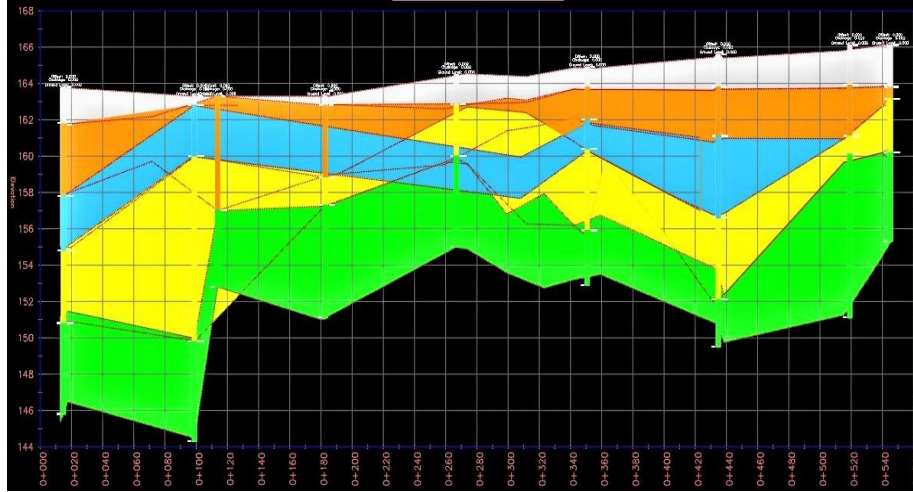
Section 3-3 – Subsoil profile below Product Cooling Tower & Product Transfer Car Track Foundation
